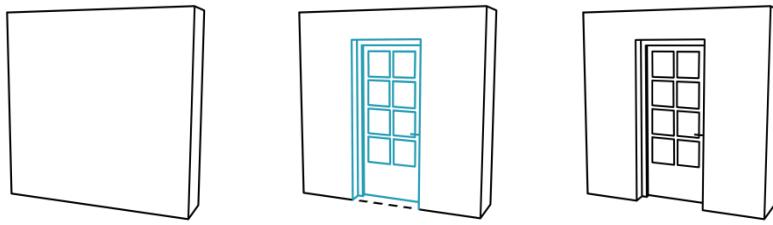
The opening in the wall for the door is automatically created when placing the door in the wall.
